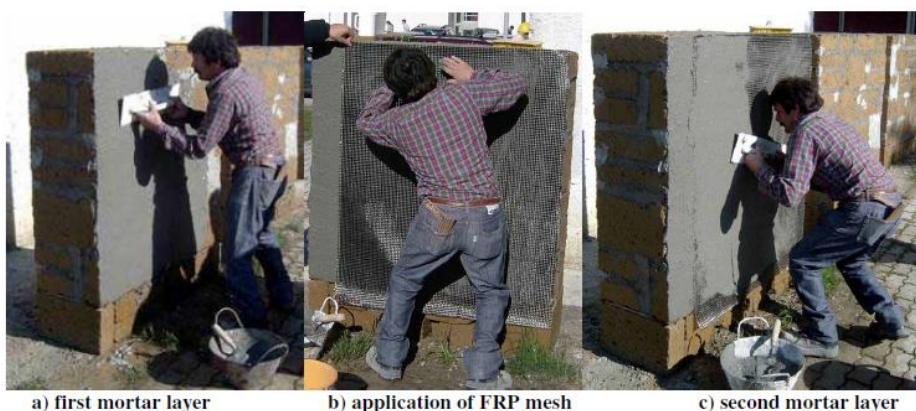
Typical installation FRP (Ciro Faella et al, 2004)
